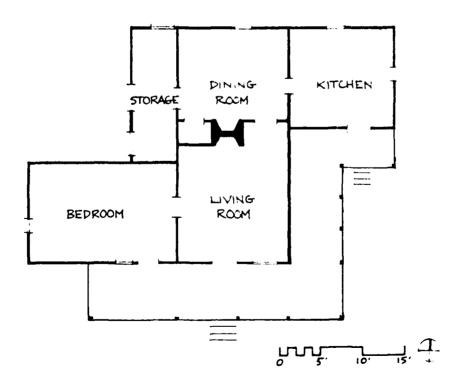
Plan of Jeffries-Gardner house. HABS plan.
